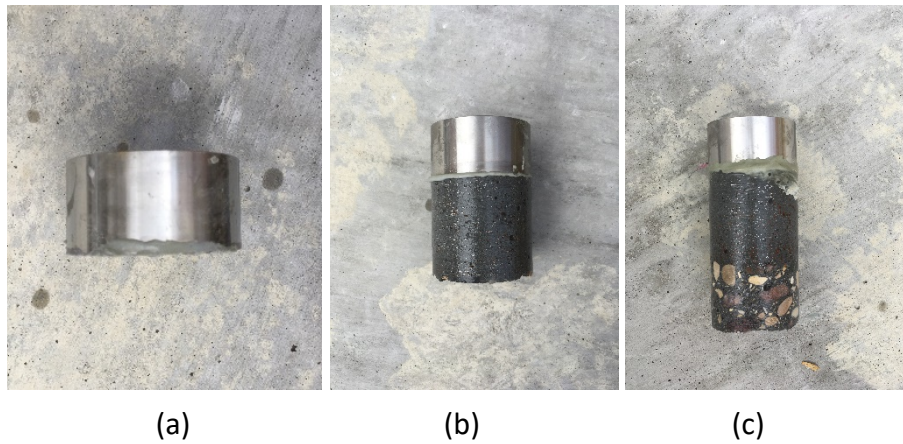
Modes of failure: (a) epoxy failure; (b) HSC failure; (c) PIF
